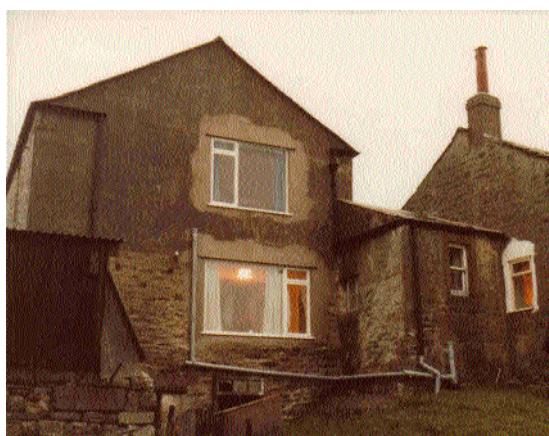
Replacement windows have been fitted close to the external face of the wall ...
